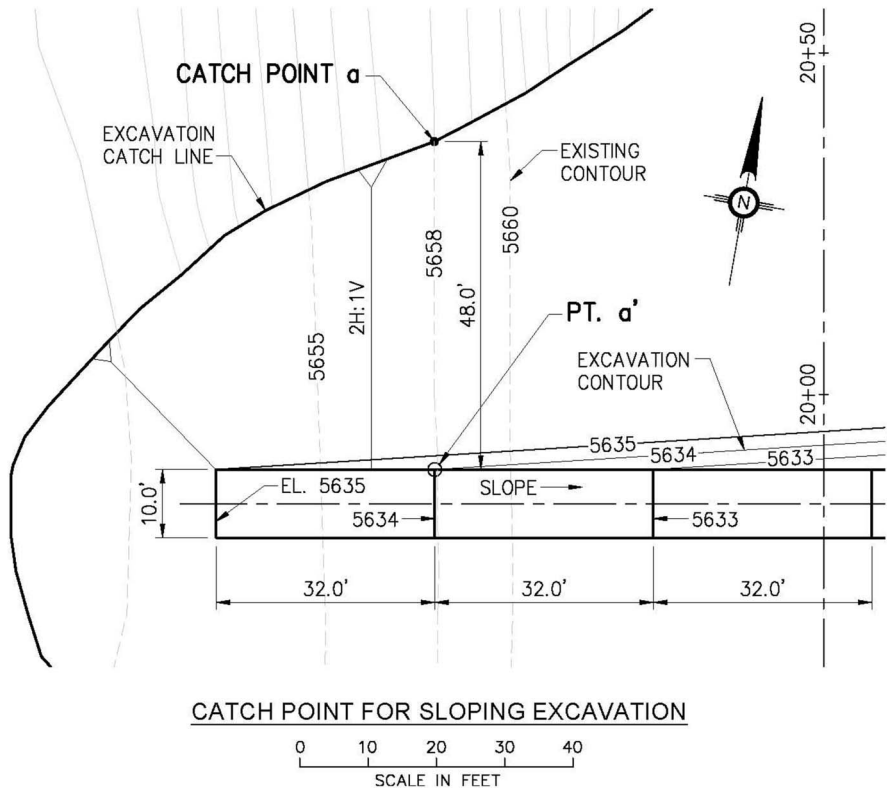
S-5. Constructing a Typical Catch Point for a Sloping Excavation
